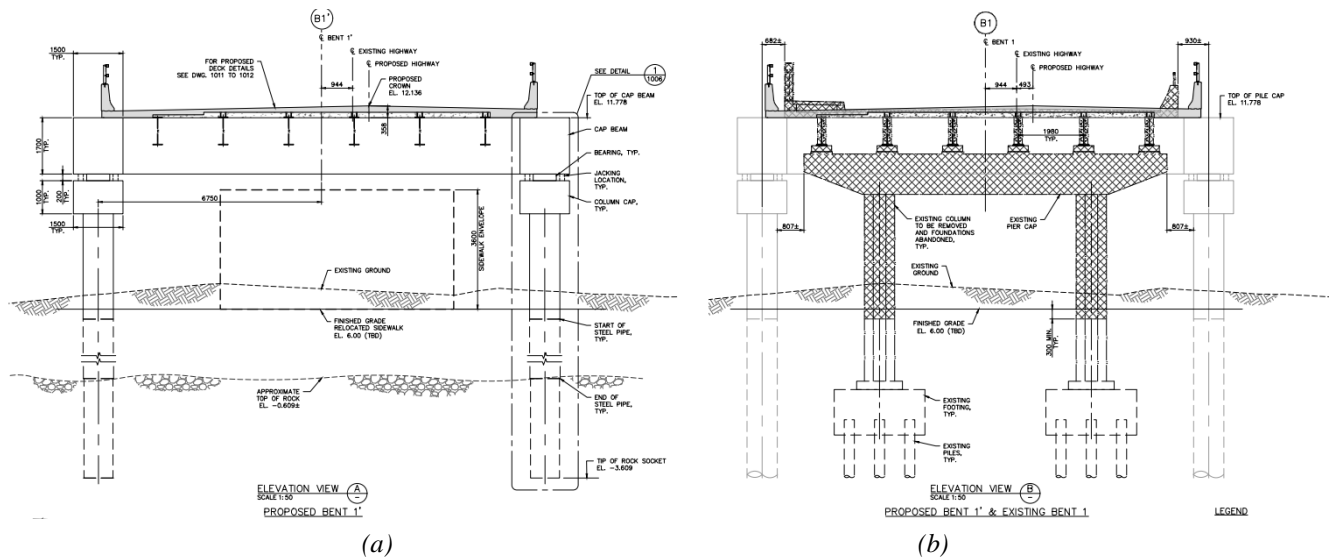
Details of the widening at Bent #1: (a) elevation view of proposed bent, (b) elevation view of existing/proposed bent
